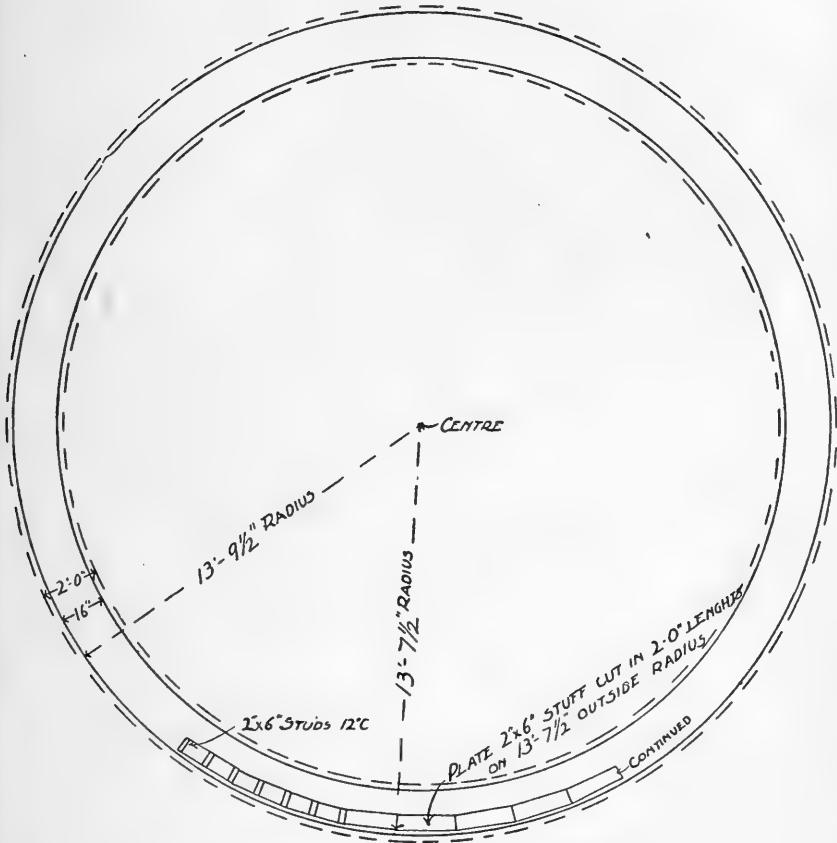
FOUNDATION PLAN OF ROUND WOODEN SILO.
